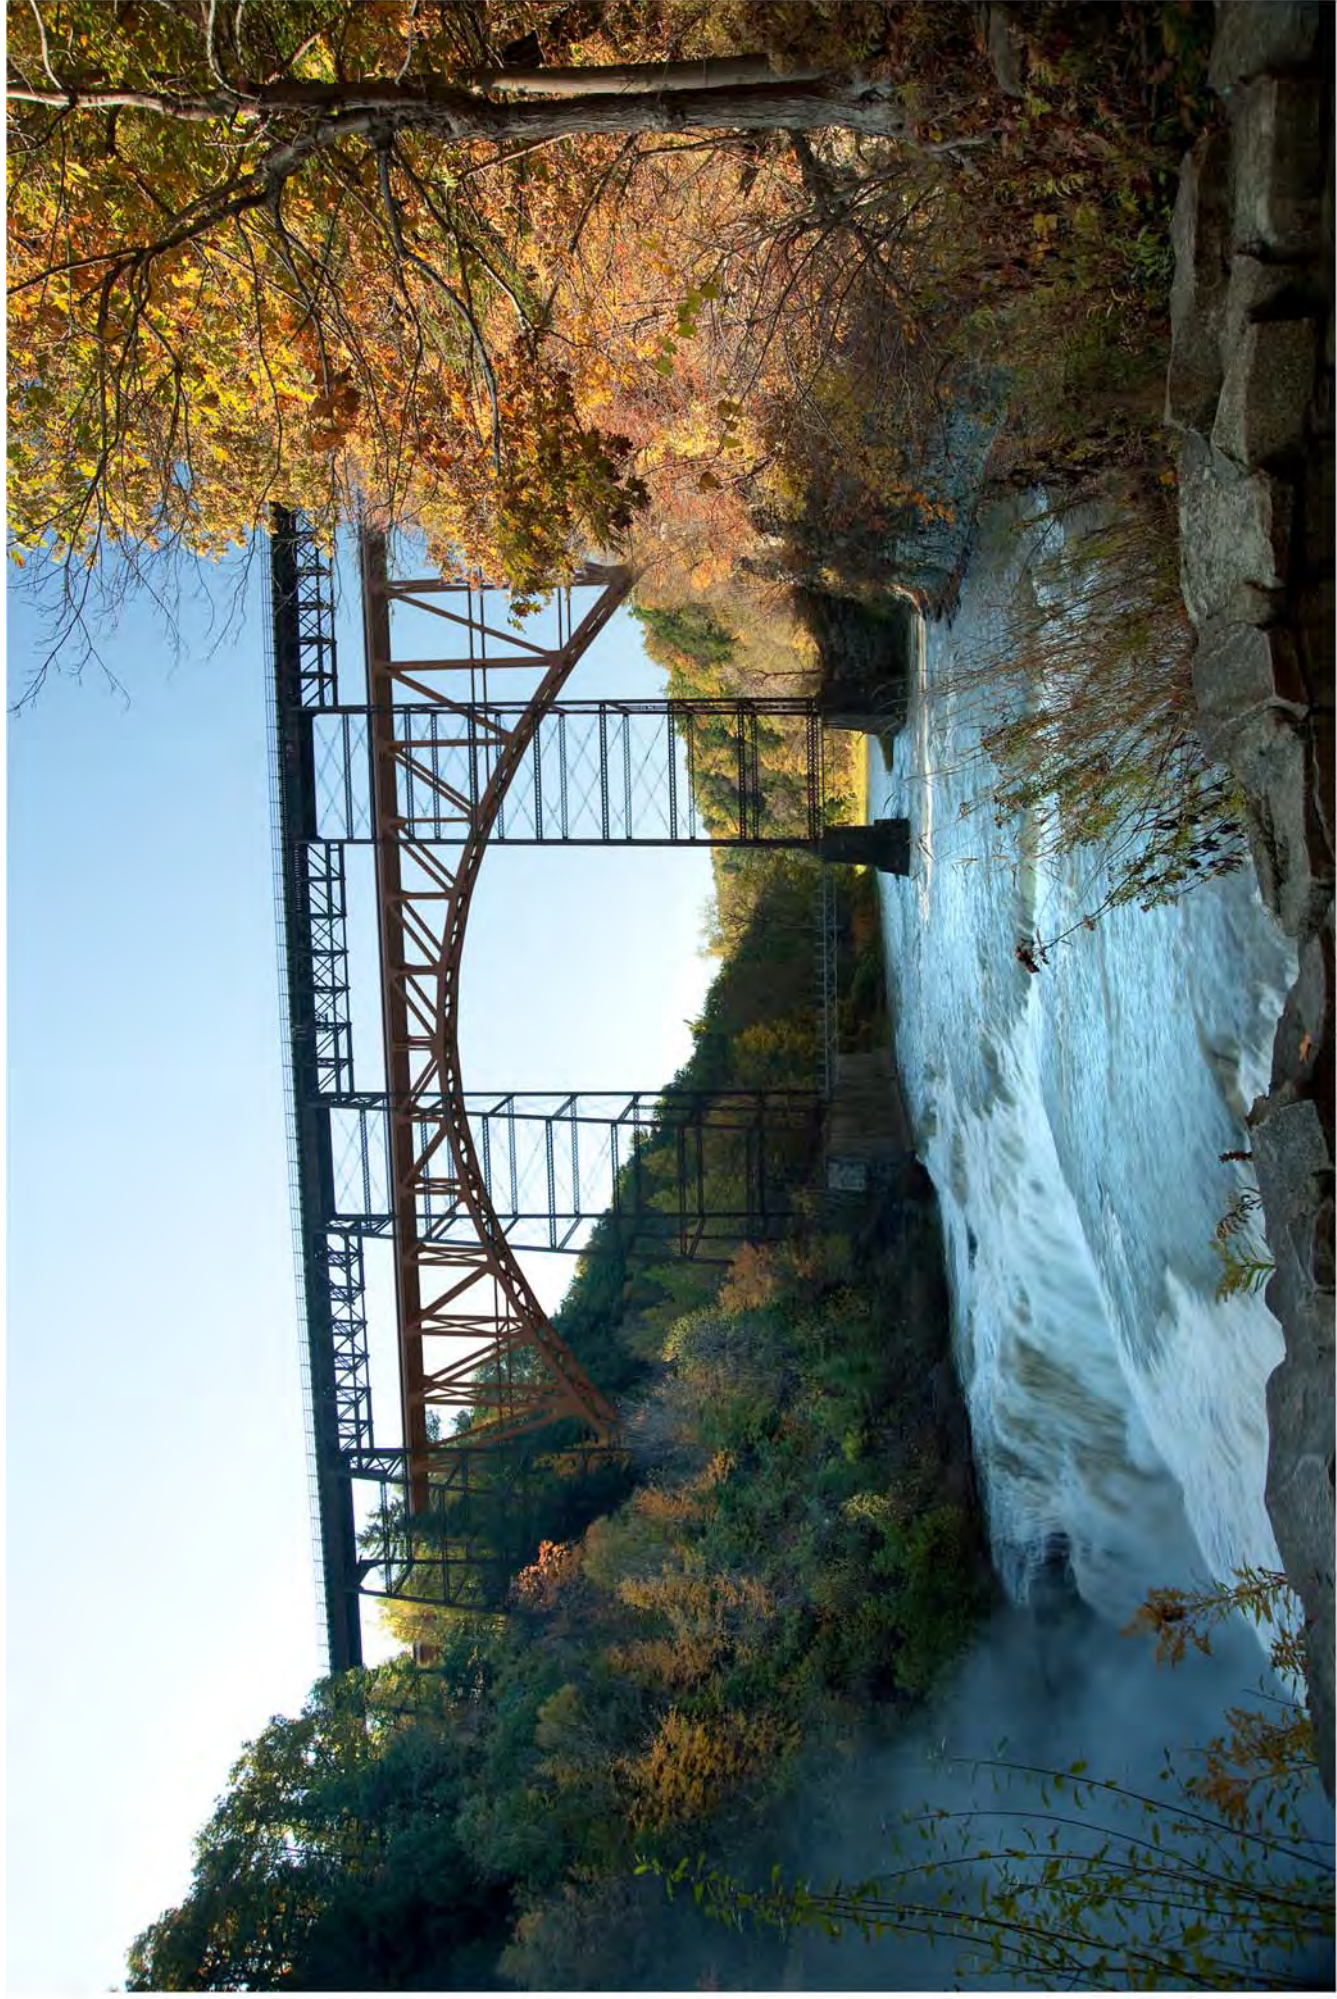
Viewpoint C_Existing and New Bridge.jpg
